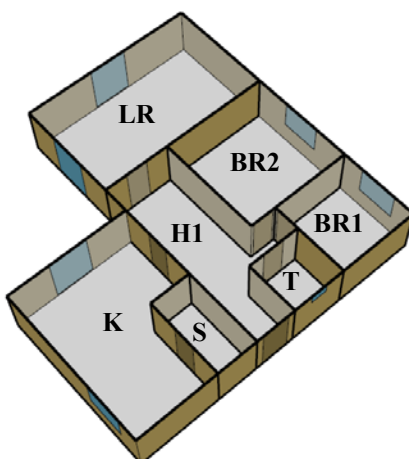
Arrangement of the rooms on the ground floor (K – kitchen, LR – living room, H1 – hall 1, T – toilet, SR – storage room, BR1 – bedroom 1, BR2 – bedroom 2).
